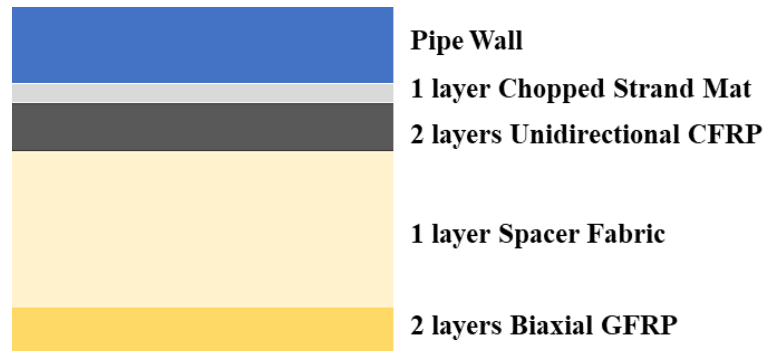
8 Cross-Sectional View of Sandwich Liner proposed by Ehsani (2019)
